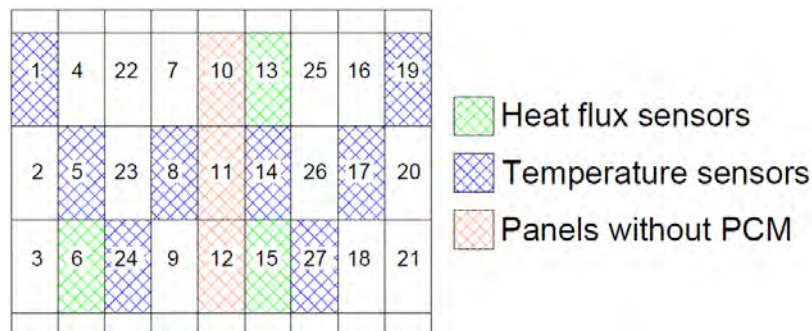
PCM-clayboard ceiling layout and sensors' location [29]
